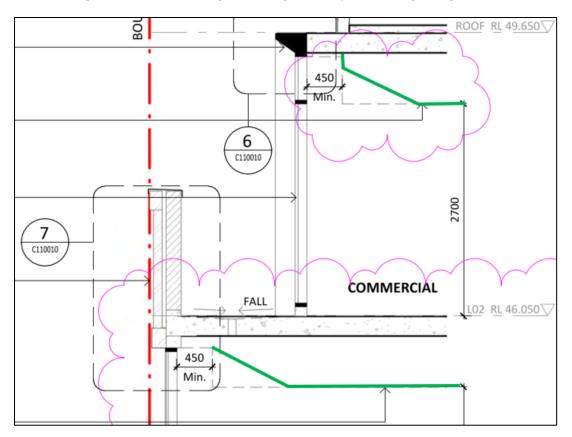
Detailed section through the infill building showing recommended angled ceilings in green
